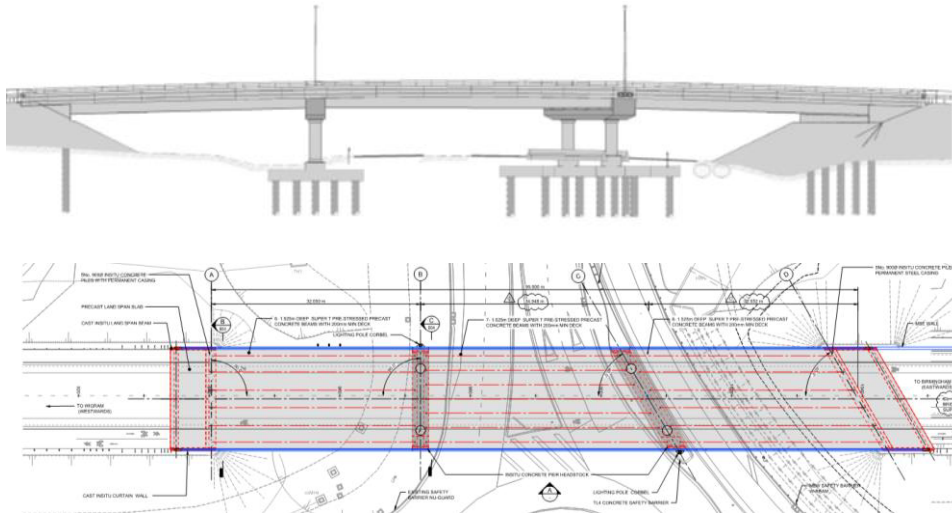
Elevation and Plan view of the Wigram Magdala Bridge (Routledge et al., 2016)
